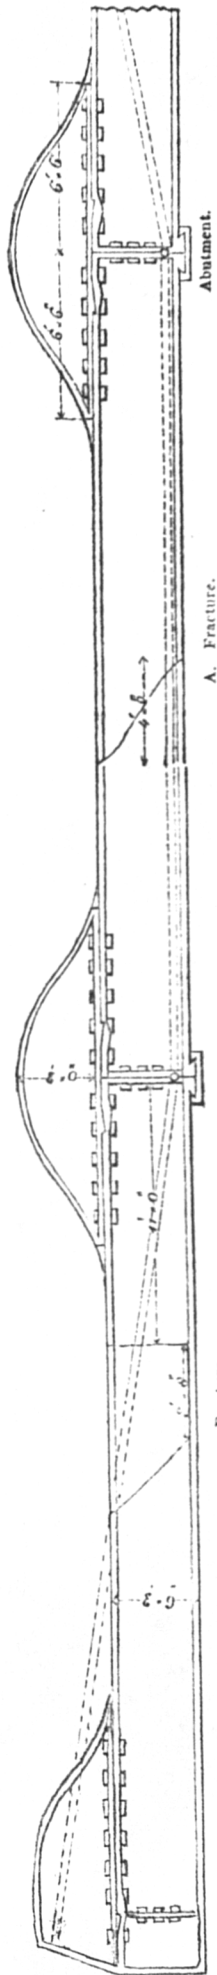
Elevation of Dee Bridge Girder 109 feet long and 98 feet in clear of the Pierings.
